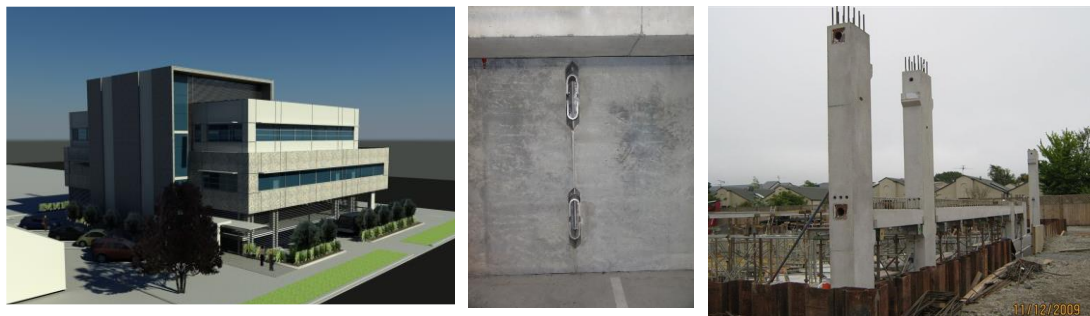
Southern Cross Hospital Endoscopy Building, Christchurc. Post-tensioned frames with internal (top-only) mild steel in one direction: Post-tensioned UFPs coupled walls in the other. Rendering, U-shape Flexural Plate dissipaters and construction of the frame (Structural Engineers: Structex Metro, Pampanin et al., 2011).
